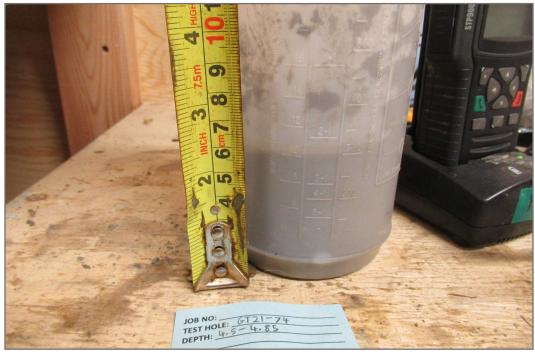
GT21-74 jar test; depth 4.5 – 4.85 m
